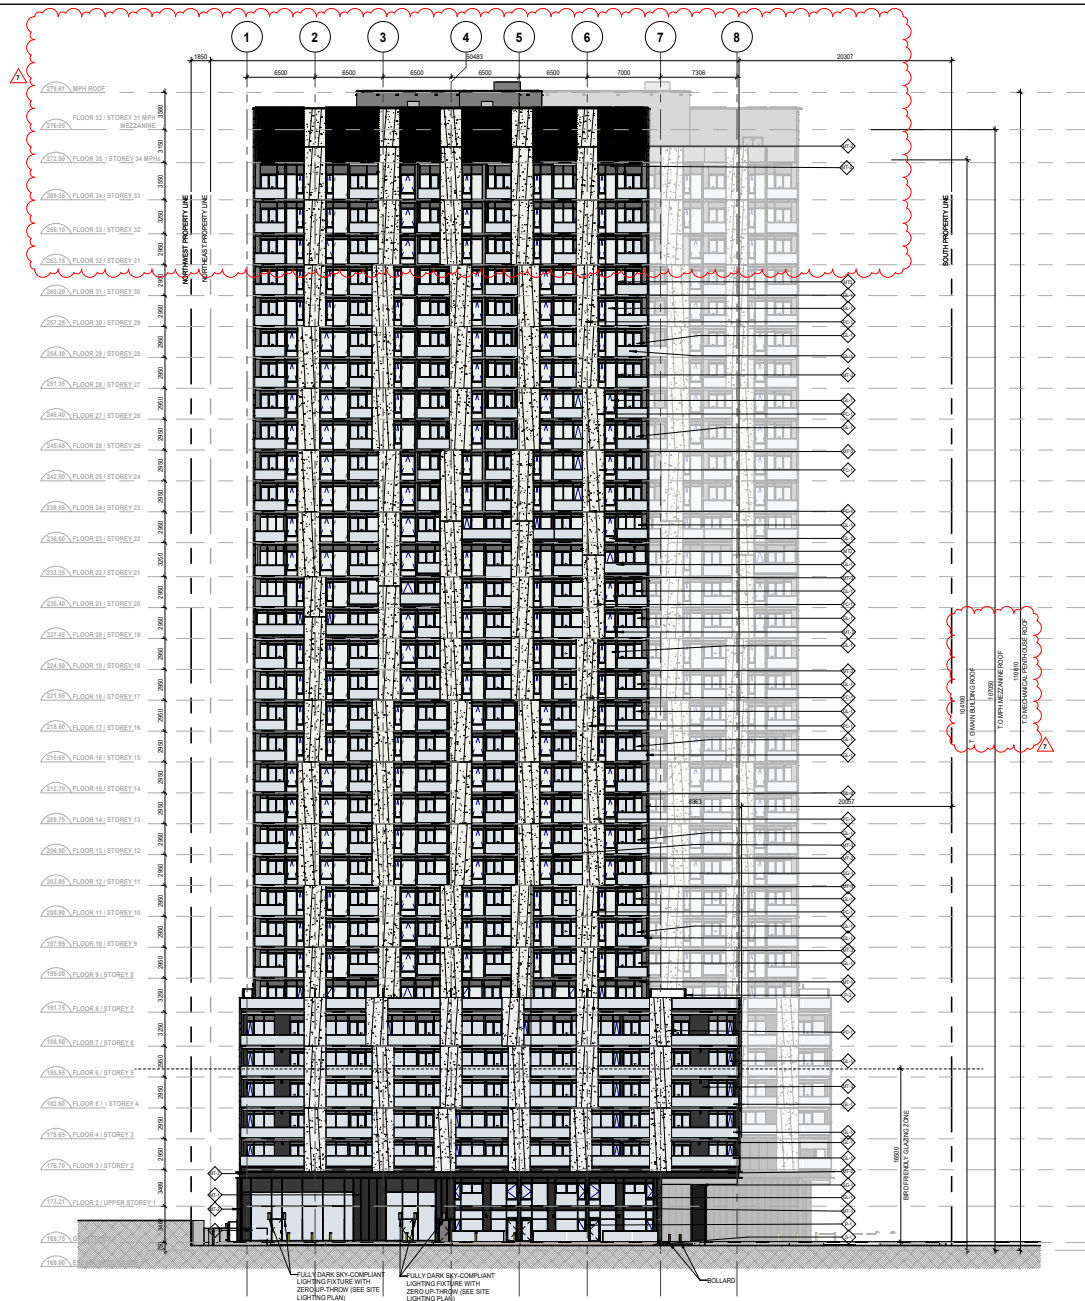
West Elevation by Quadrangle Architects Limited (not to scale)
